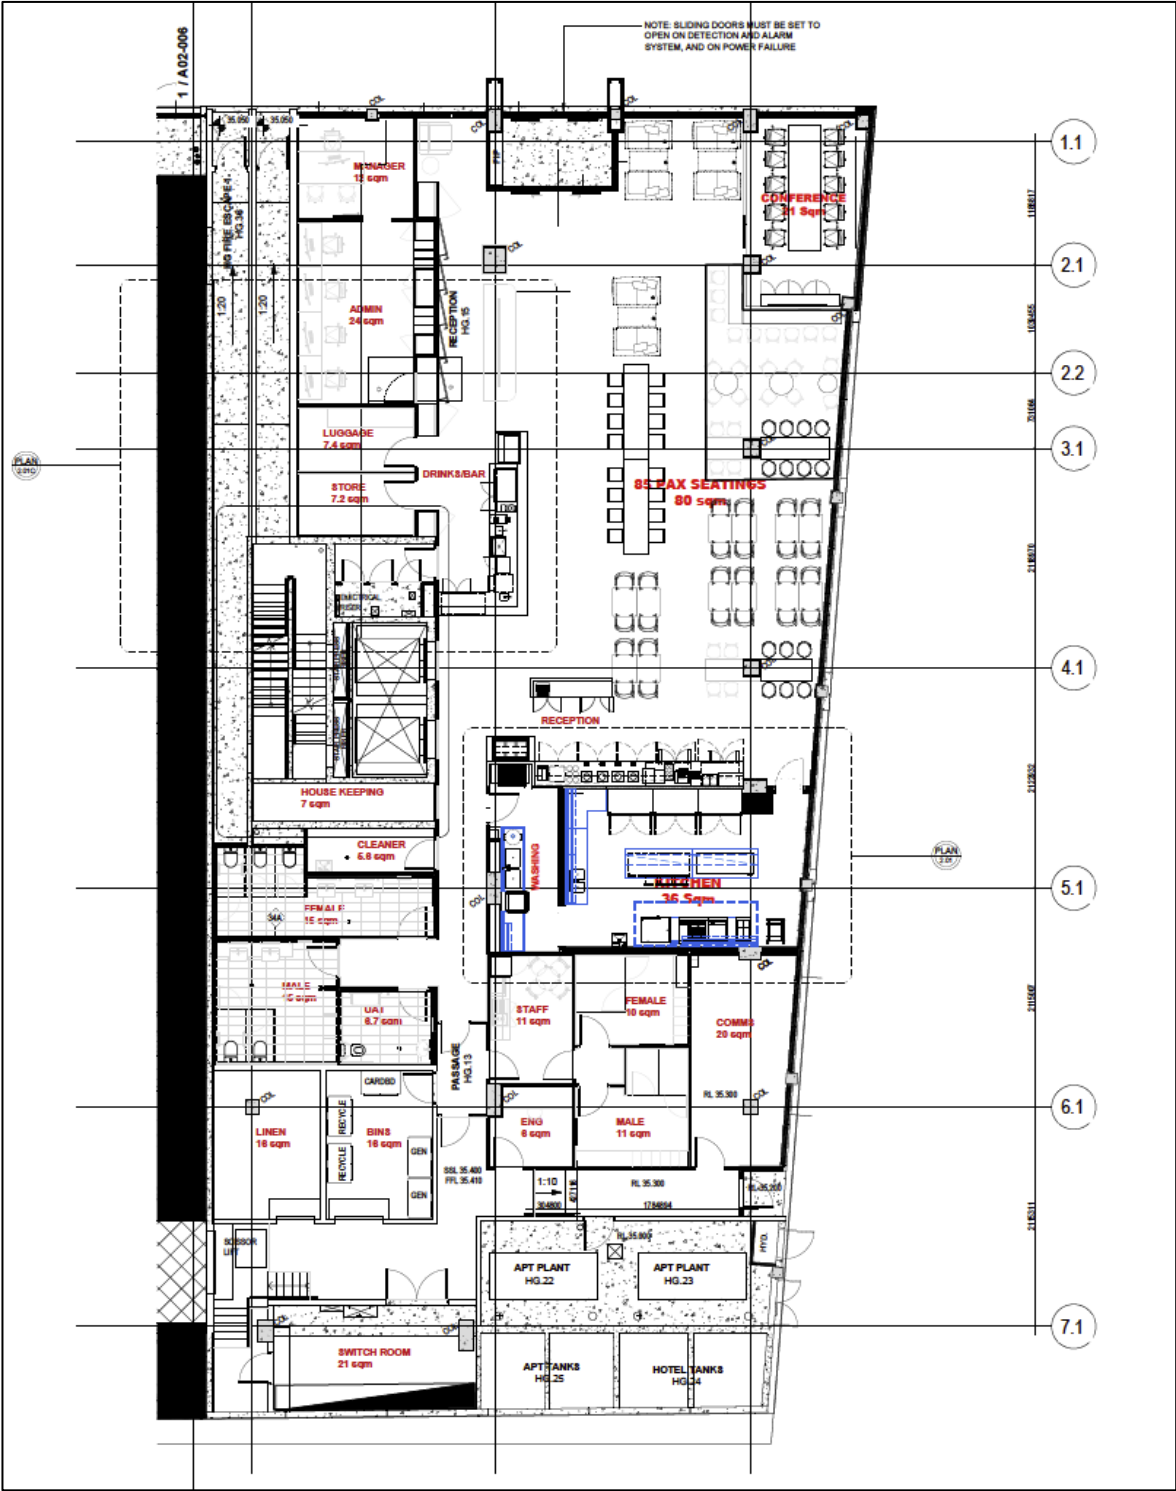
Holiday Inn Express Cockburn Central - Ground Floor plan⁴
